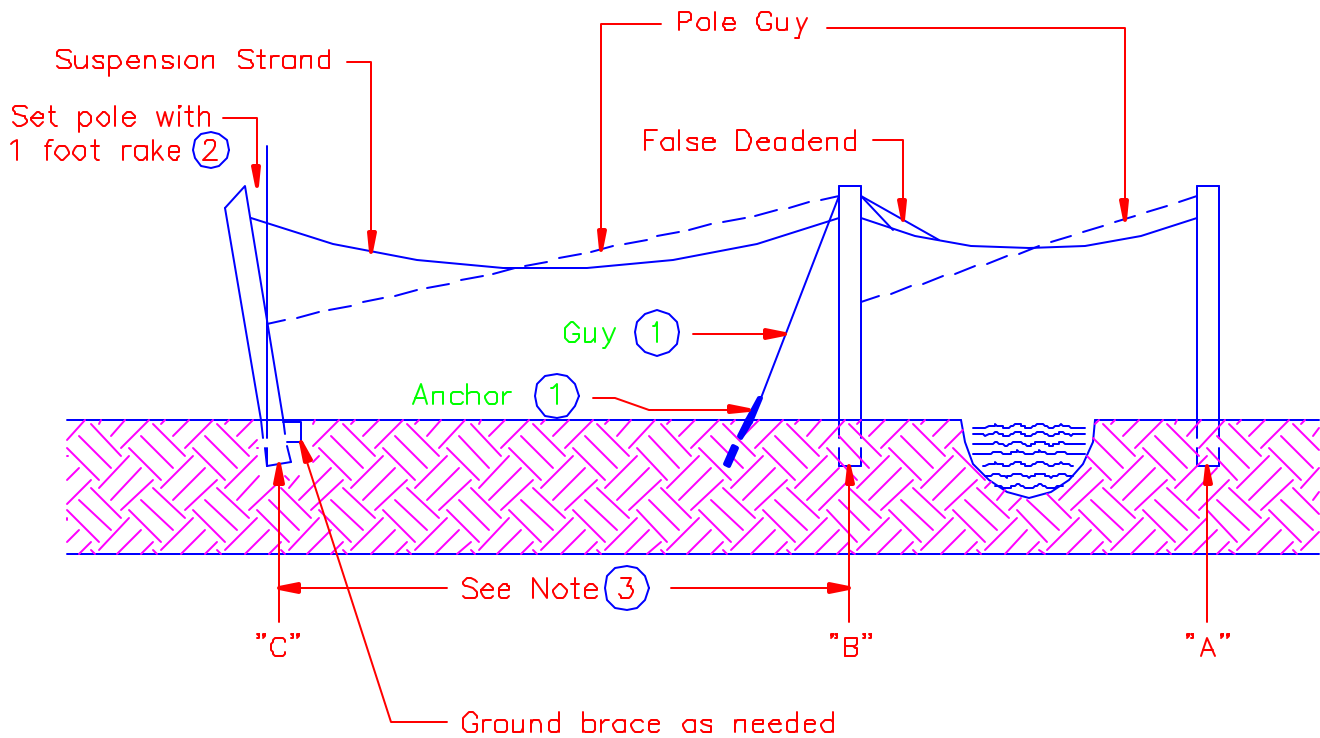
SLACK SPAN CONSTRUCTION EXAMPLE
